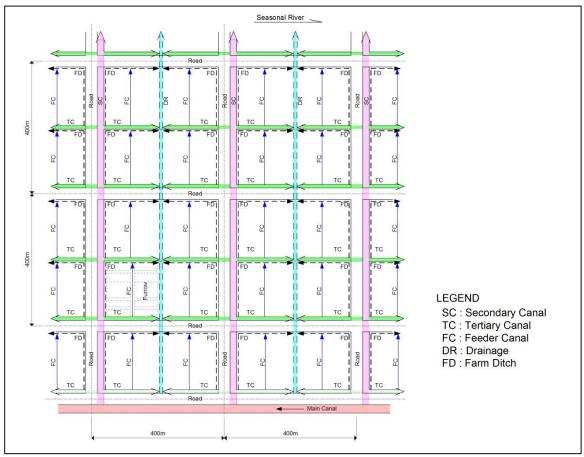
Layout of Irrigation and Drainage Facilities in Command Area
